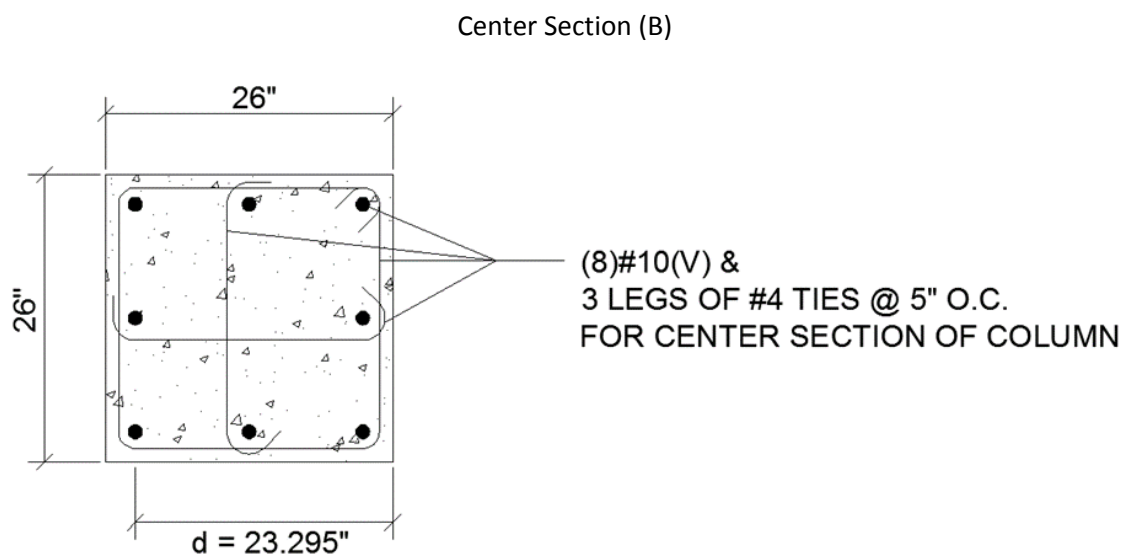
Exterior column, cross-section at center of column at ground floor level based on tsunami design requirements.
